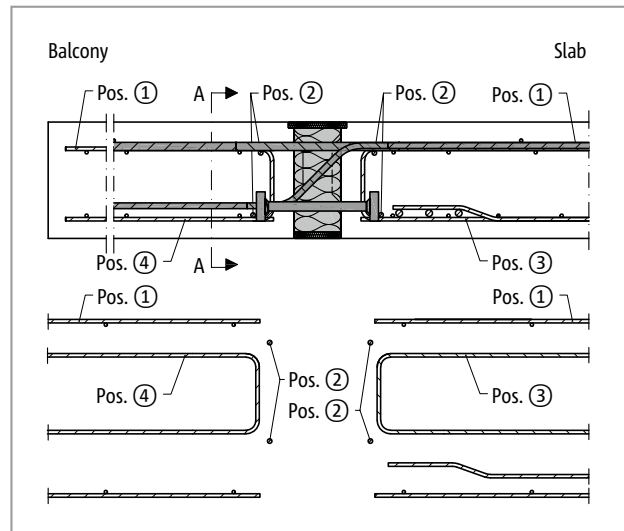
Schöck Isokorb® T type K-M12: On-site reinforcement with indirect support
